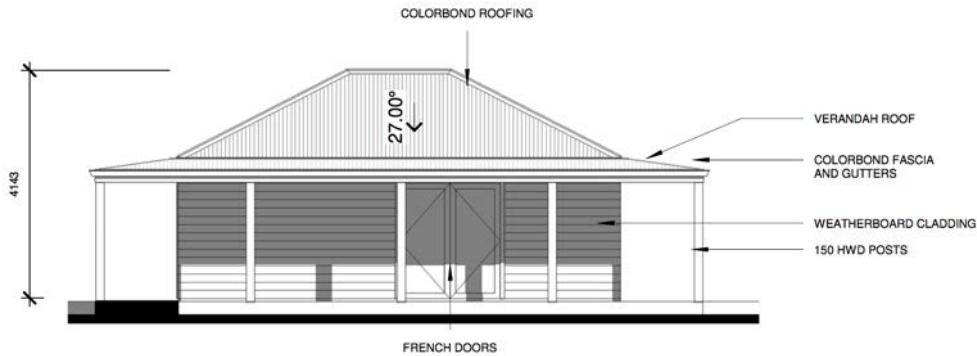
Community Building West Elevation. Source: PLAY DESIGN STUDIO
